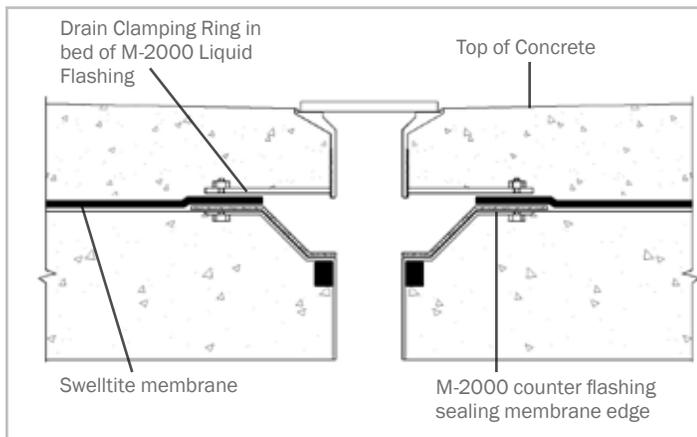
Deck drain detail. CETCO recommends using a double stage drain for all deck drains.
